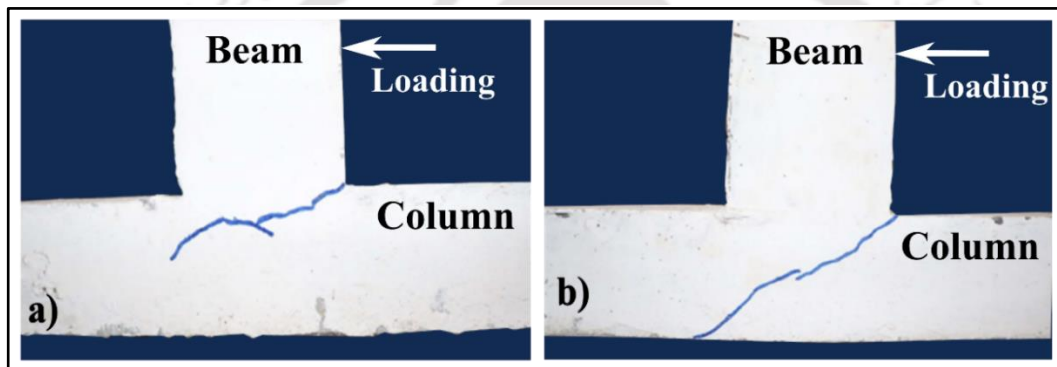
Crack pattern and failure mechanism of specimens: a) NS-A, and b) NS-B
